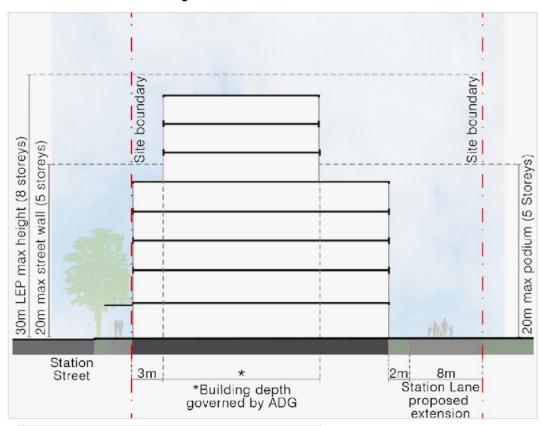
Station Street East/Lane Street Precinct – Typical East West Section
